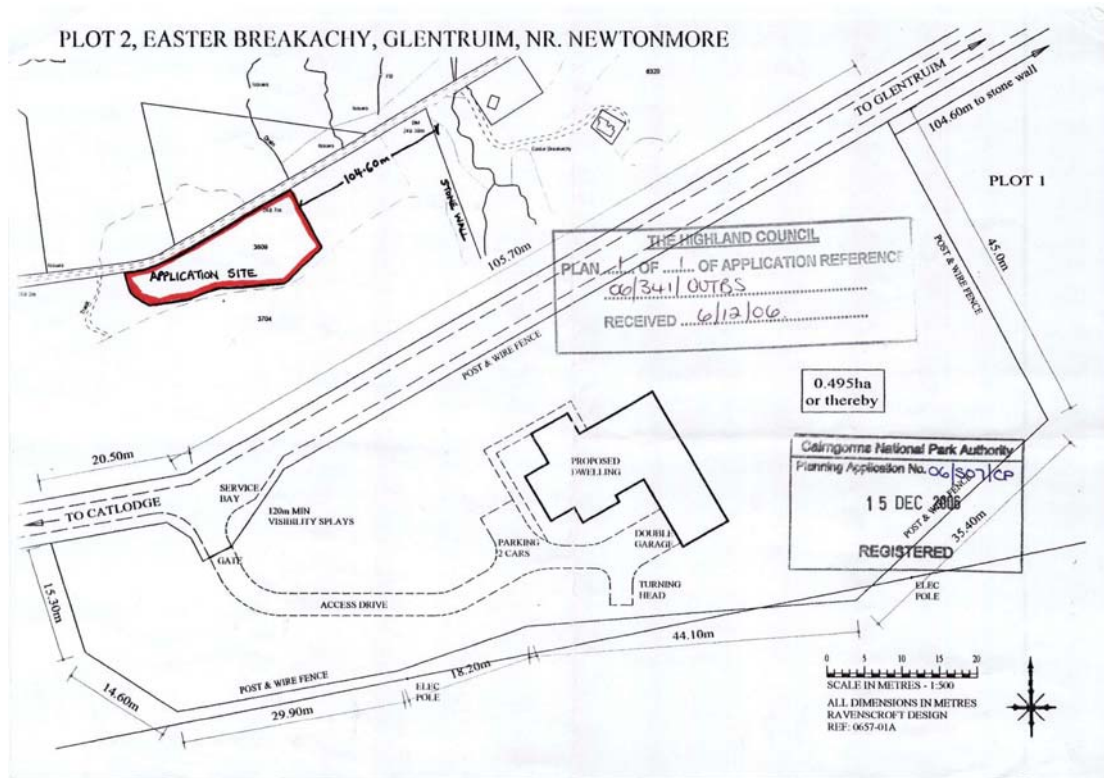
Plan accompanying application showing access and indicative position for dwelling.
